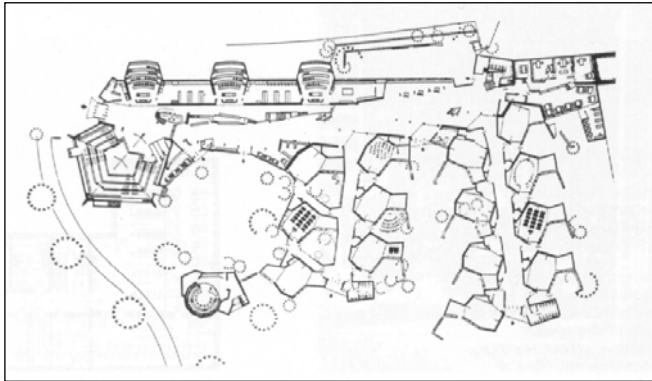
Layout plan of Geschwister-Scholl School, Lünen; Hans Scharoun, 1962. (Source: Wiegmann, 2003, p.168)
